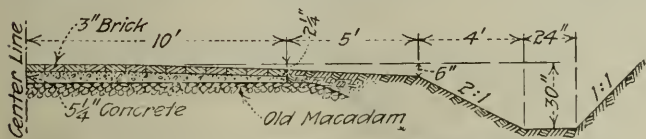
SECTION OF PAVEMENT FRACTURED BY HEAT
